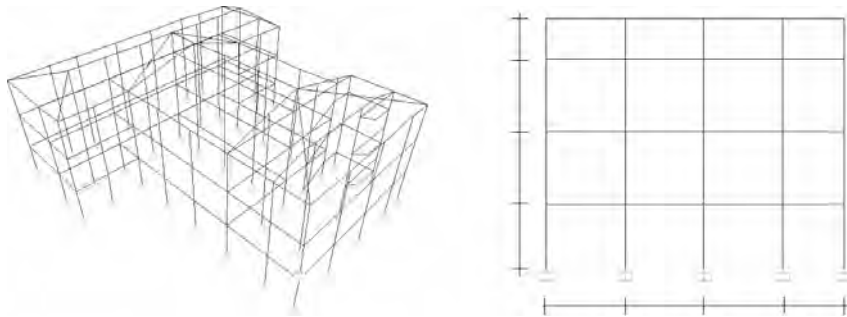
a. The tri-dimensional view of the scholastic building. b. The central frame of the case-study building.
